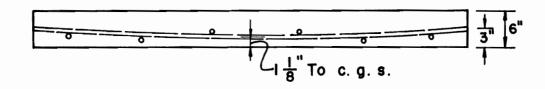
LAYOUT OF PRESTRESSED CONCRETE LIFT SLAB
